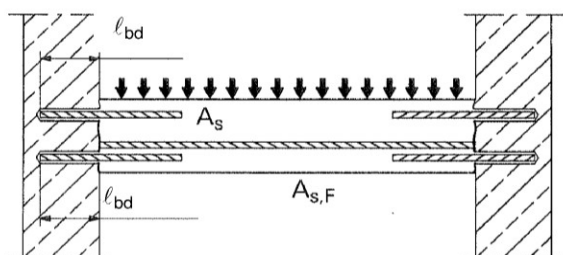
Overlapping joint for rebar connections of slabs and beams
